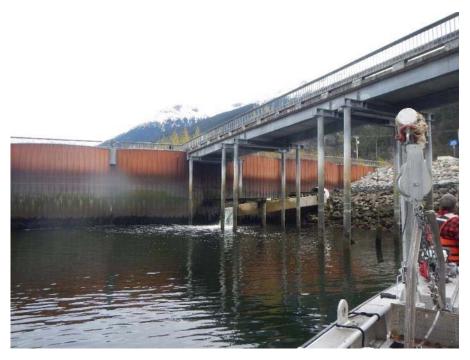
Broadway Dock, Outlet of Pullen Creek and Sample Location SED17-19.
